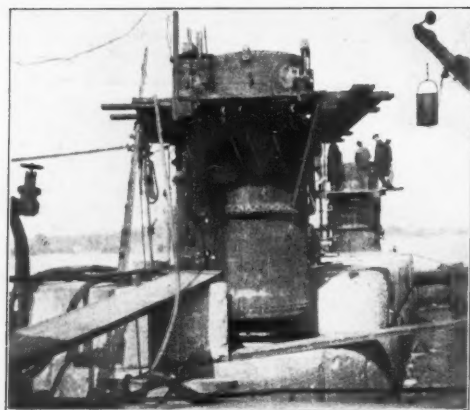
Caisson and Air Locks Used in Sinking Pier No. 3.
